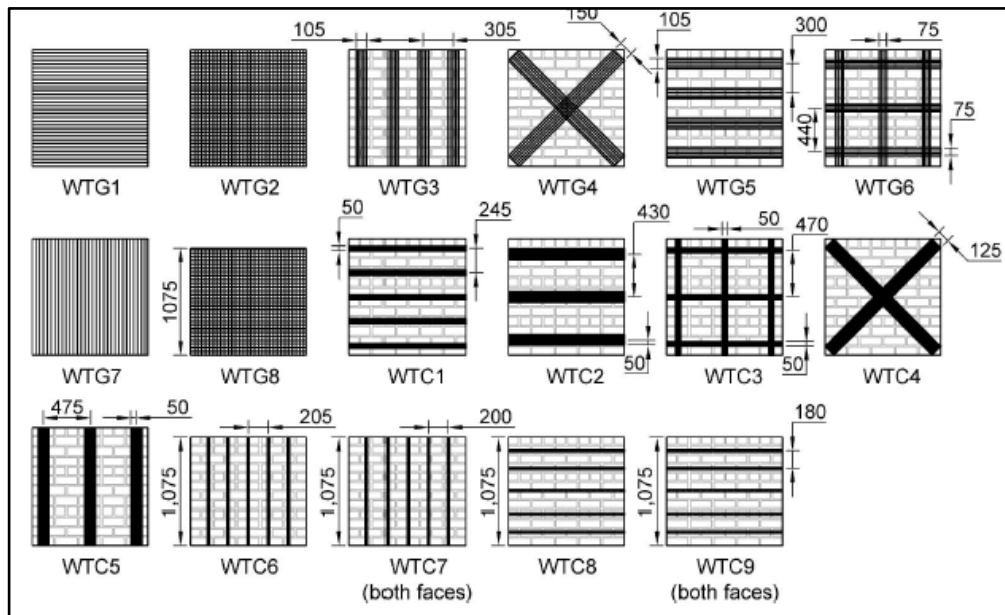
FRP retrofit details (all dimension in mm); Wallette height is 1.170mm unless otherwise noted [51]
